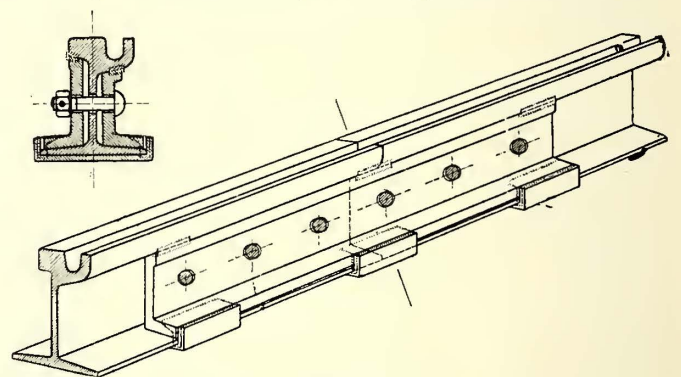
Berlin Rail Welding—Three-Point Weld at the Base and Under the Head
